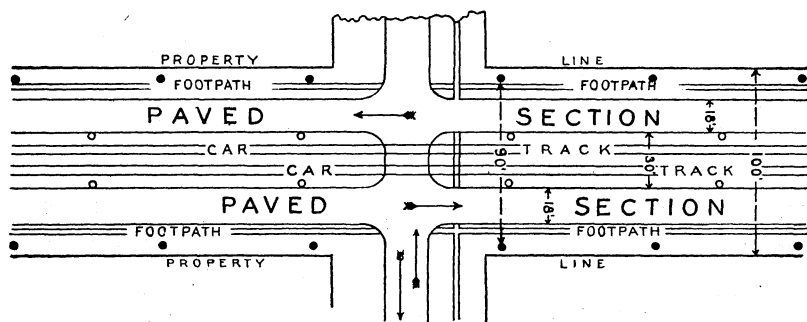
A 100-foot right of way with a 30-foot central strip in which the trolley tracks are located, flanked by two 18-foot roadways. The tree rows are 90 feet apart, with the trees 80 feet apart in the row.
